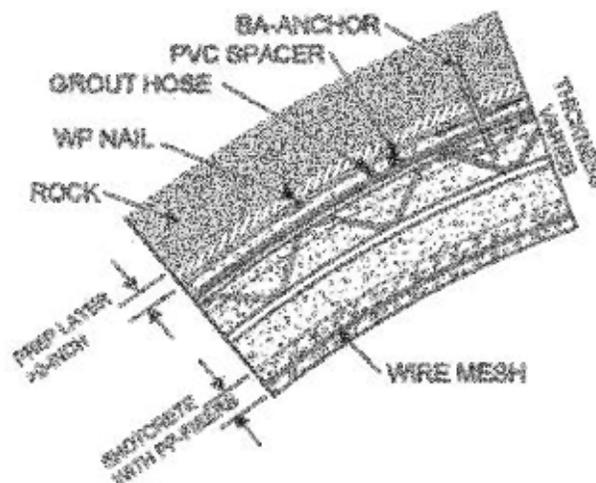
Typical Shotcrete Final Lining Detail (Reference 1)
